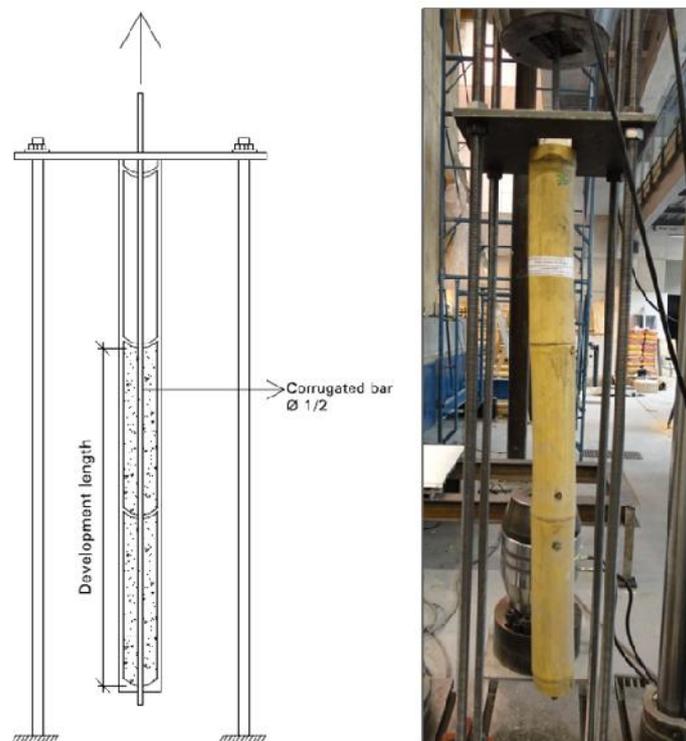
Assembly and instrumentation of shear wall-foundation connection test
